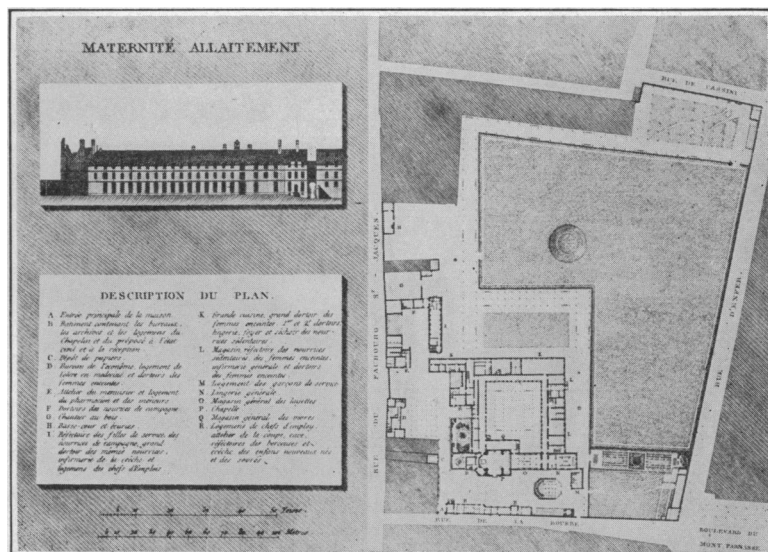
Hôpital de la Maternité. Bessat's ground plan and front elevation, drawn in 1811
